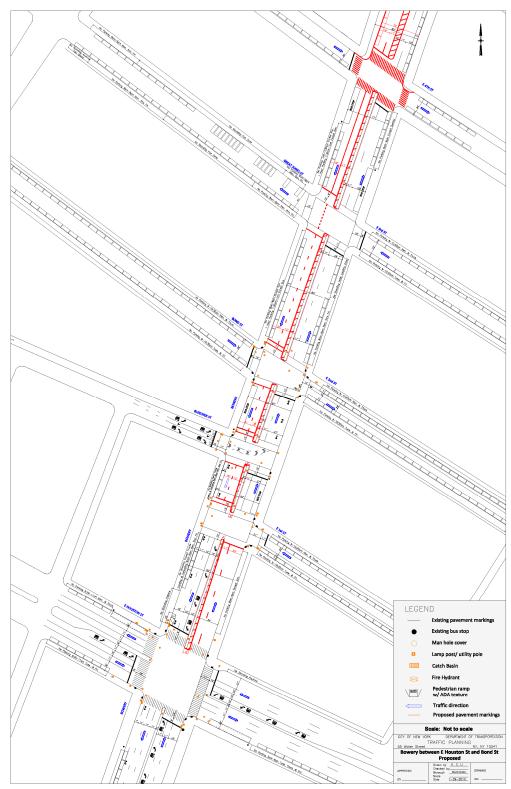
Bowery between 4th Street and Houston Street - Proposed
